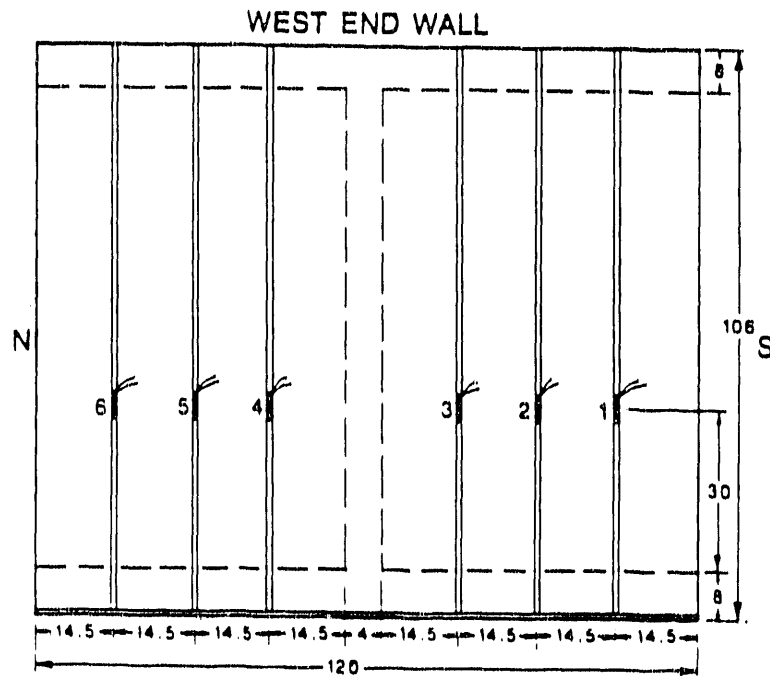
West end wall layer of reinforcement and strain gage locations. (All dimensions are in inches).
